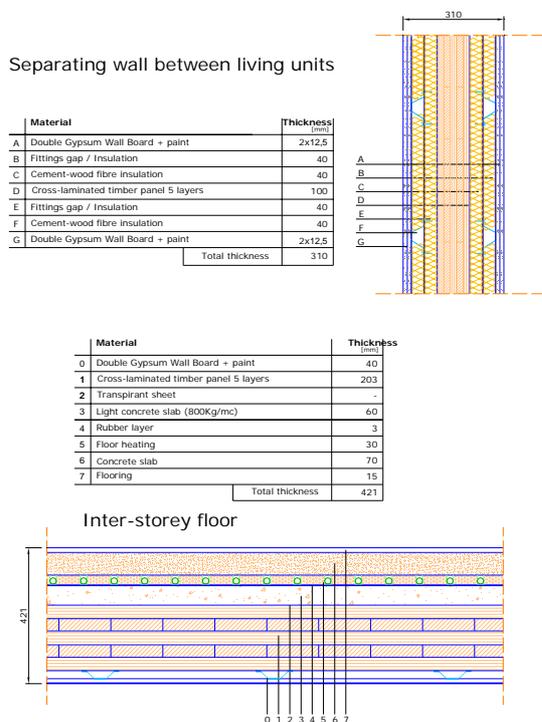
Detail of the separating wall between living units and of the inter-storey floor.
